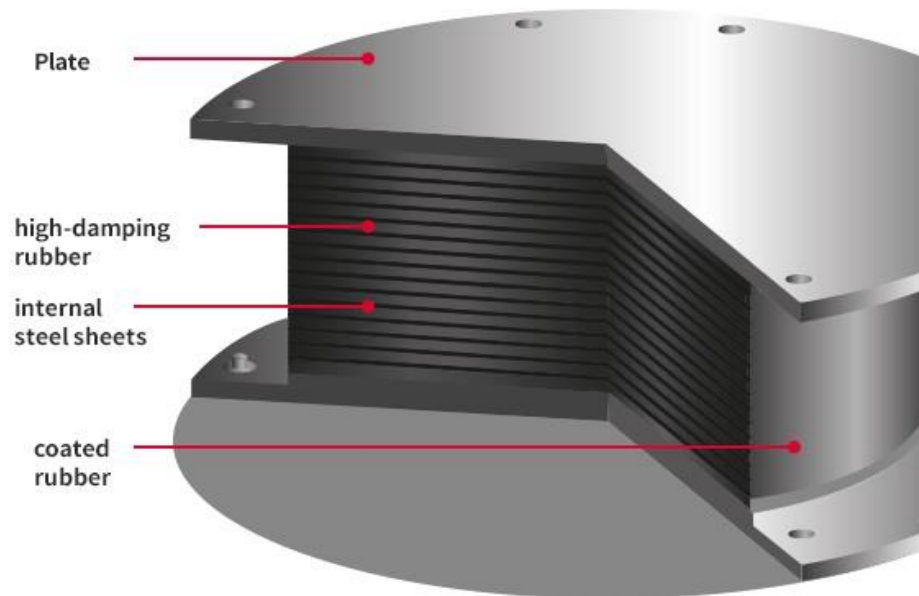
High Damping Rubber Bearing (HDRB) in section.
